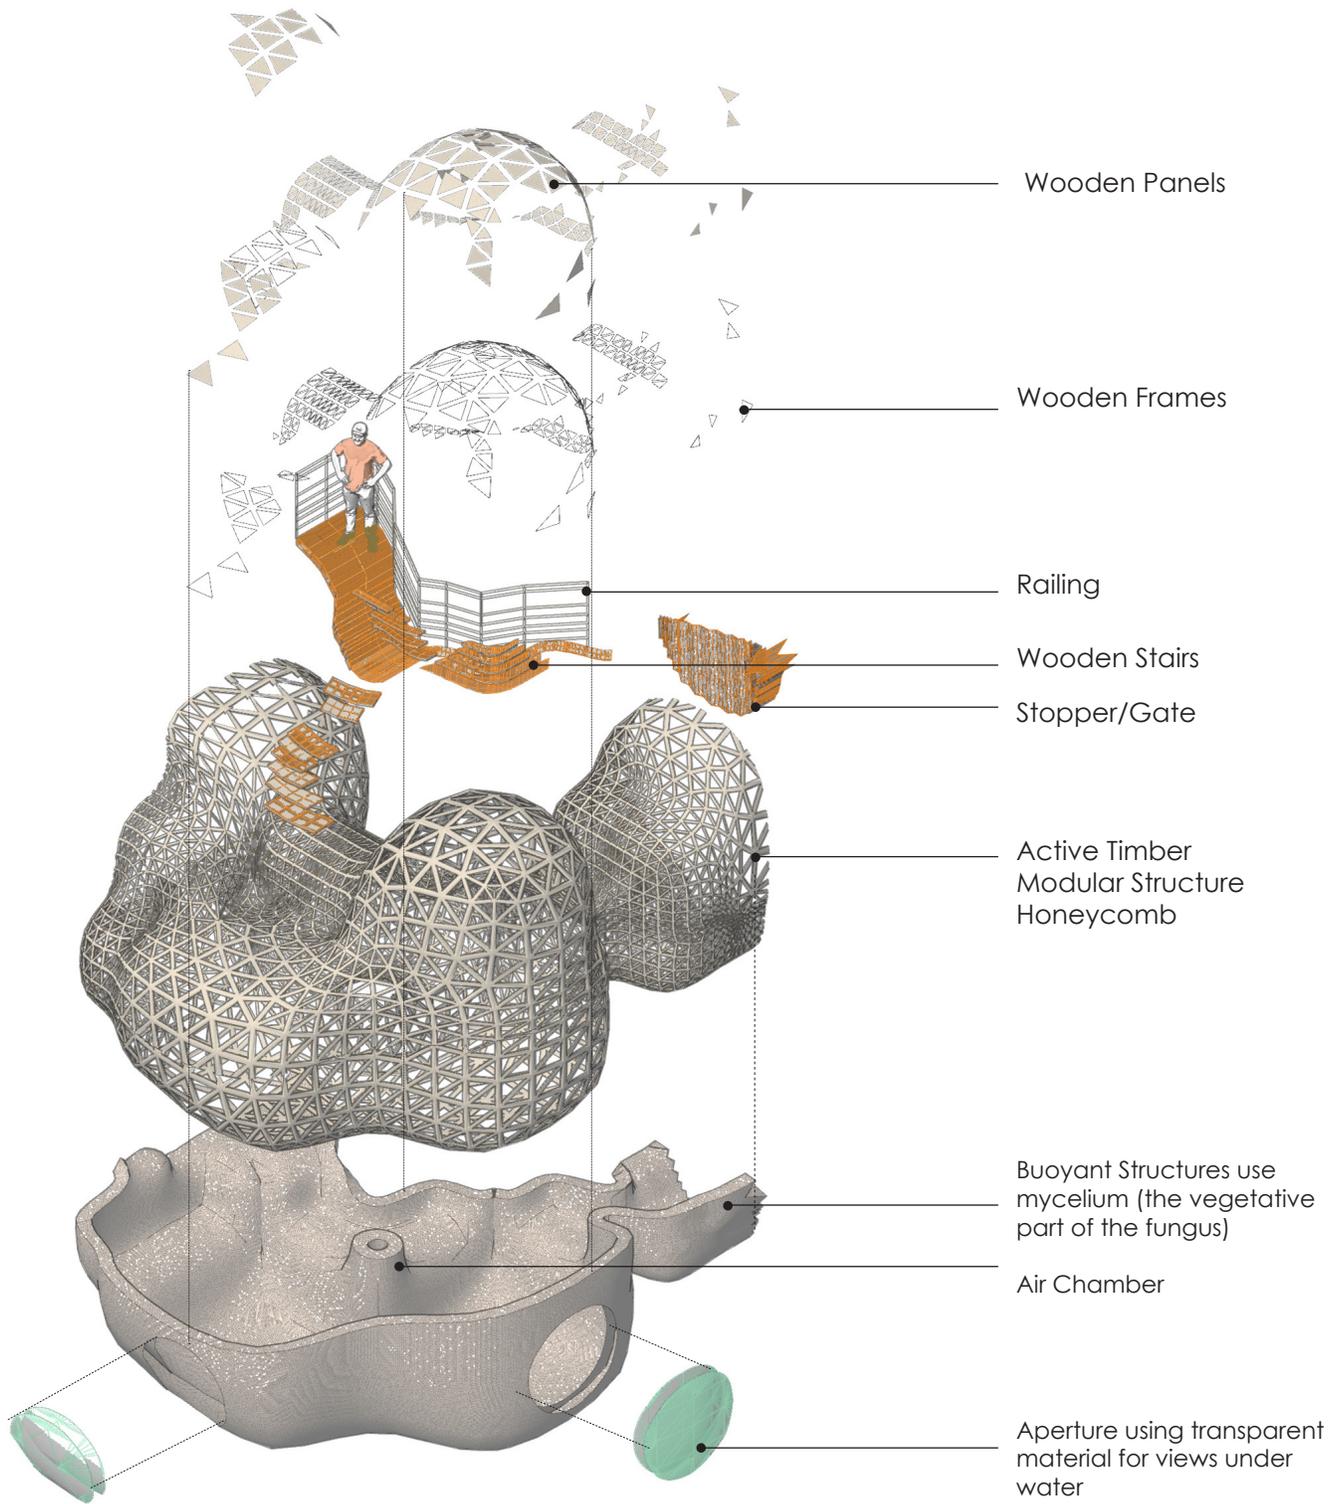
Exploded Axonometric View of A Floating Islands. Drawing by author
